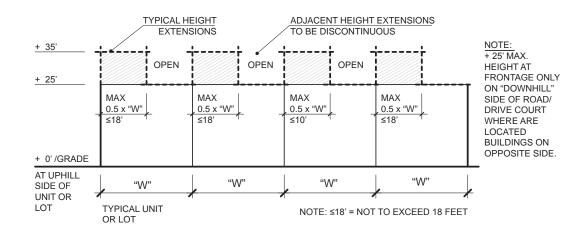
ELEVATION DIAGRAM OF BUILDING FRONTAGE ON THE 'DOWNHILL' SIDE OF A ROAD OR DRIVE COURT WITHI BUILDINGS LOCATED ON OPPOSITE OR 'UPHILL' SIDE
